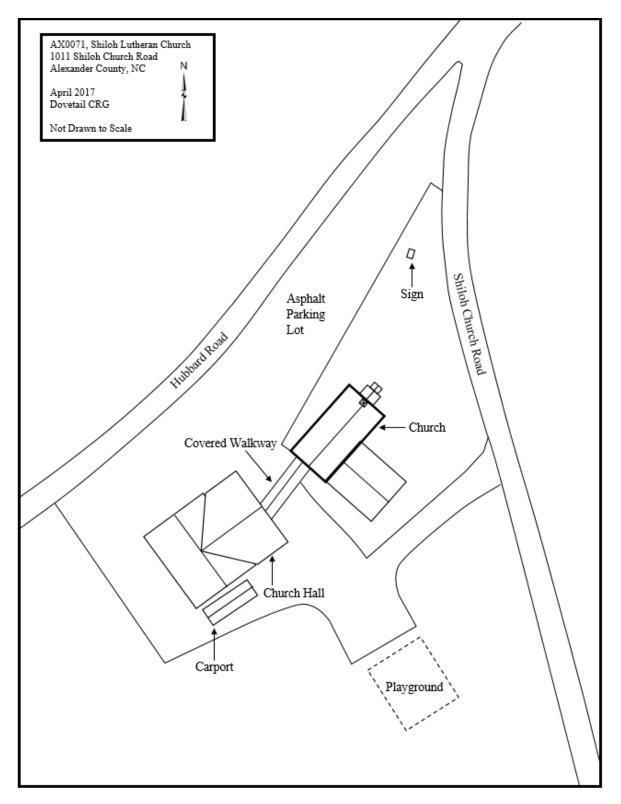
Site Plan for Shiloh Lutheran Church (AX0071).
